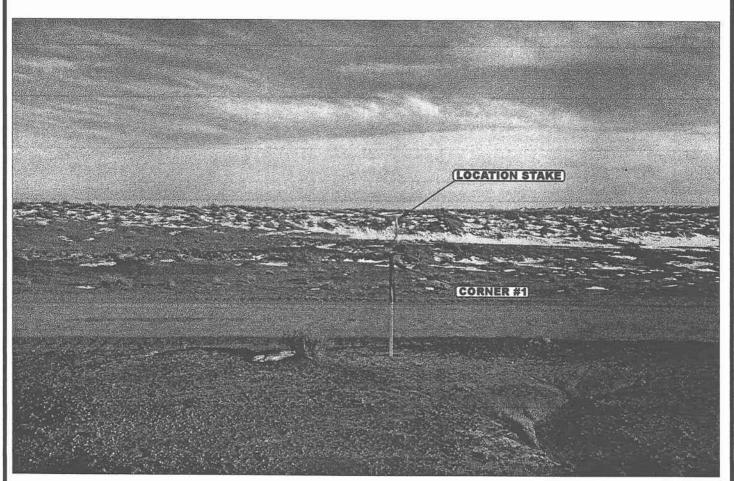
PHOTO: VIEW FROM CORNER #1 TO LOCATION STAKE
